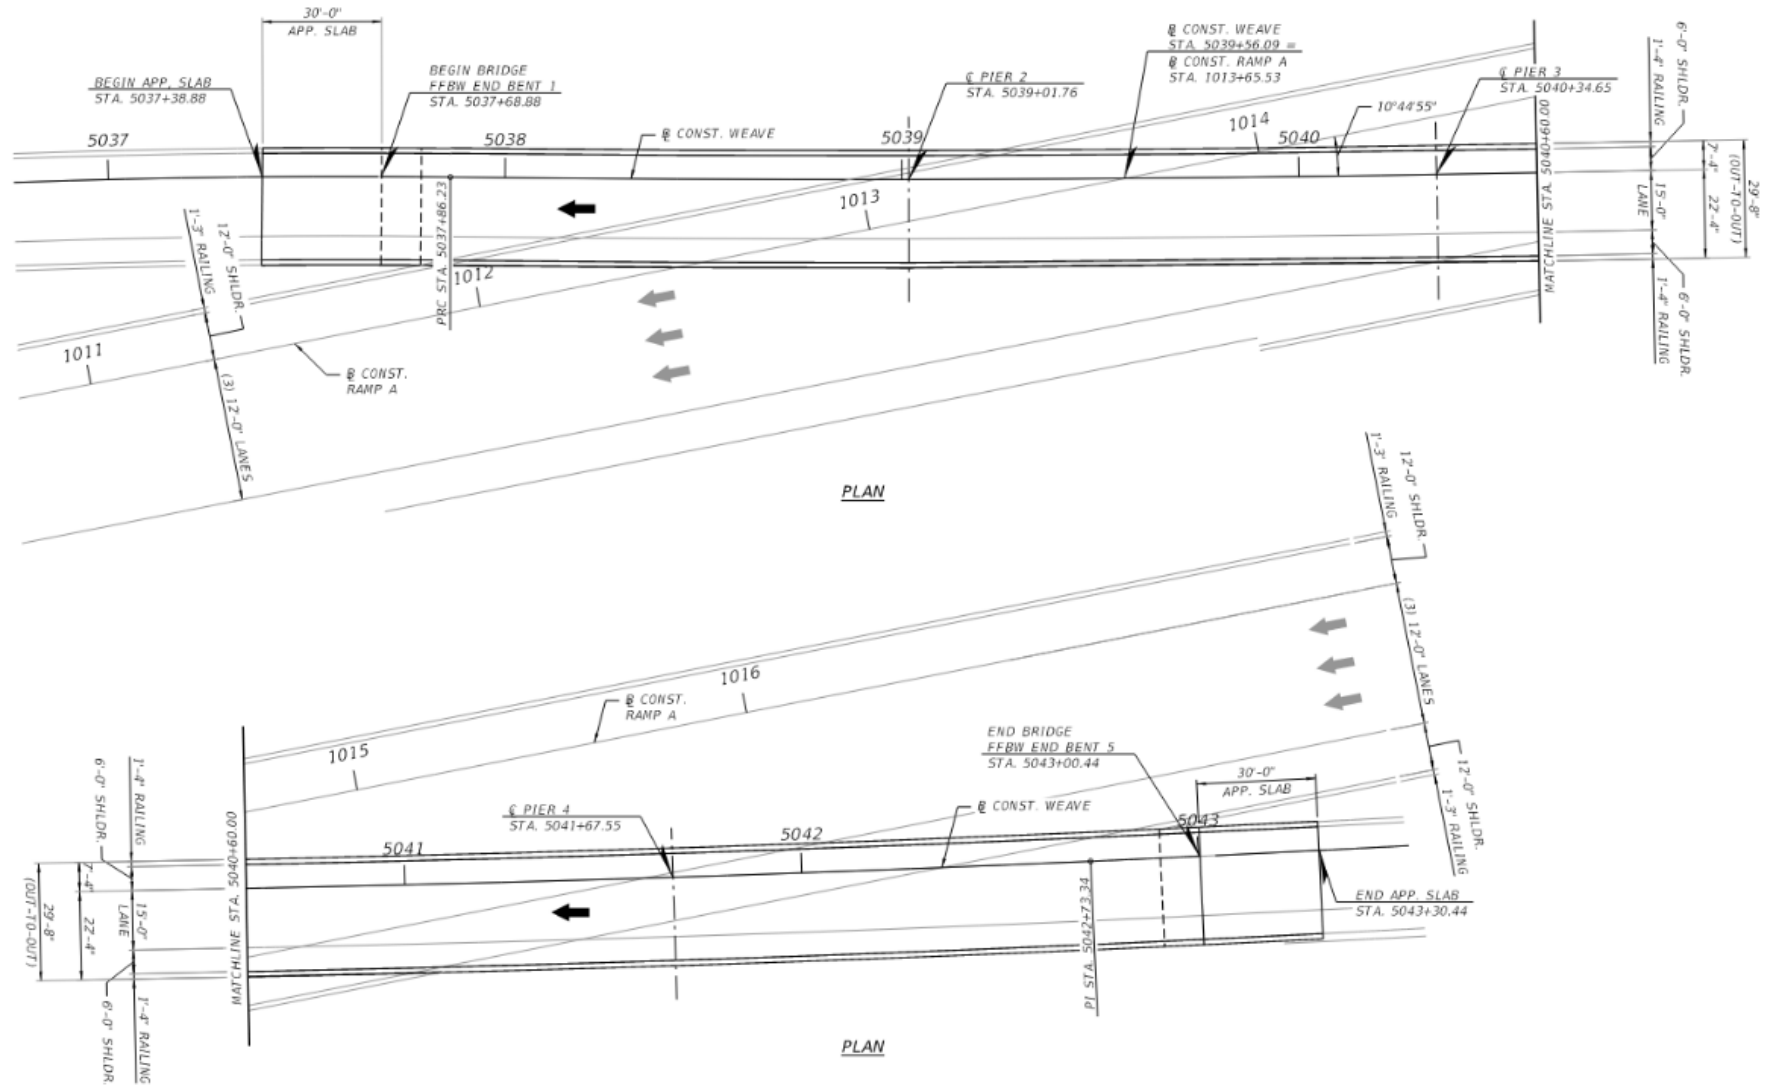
Proposed Braided Ramp Bridge over Ramp A Horizontal Geometry
